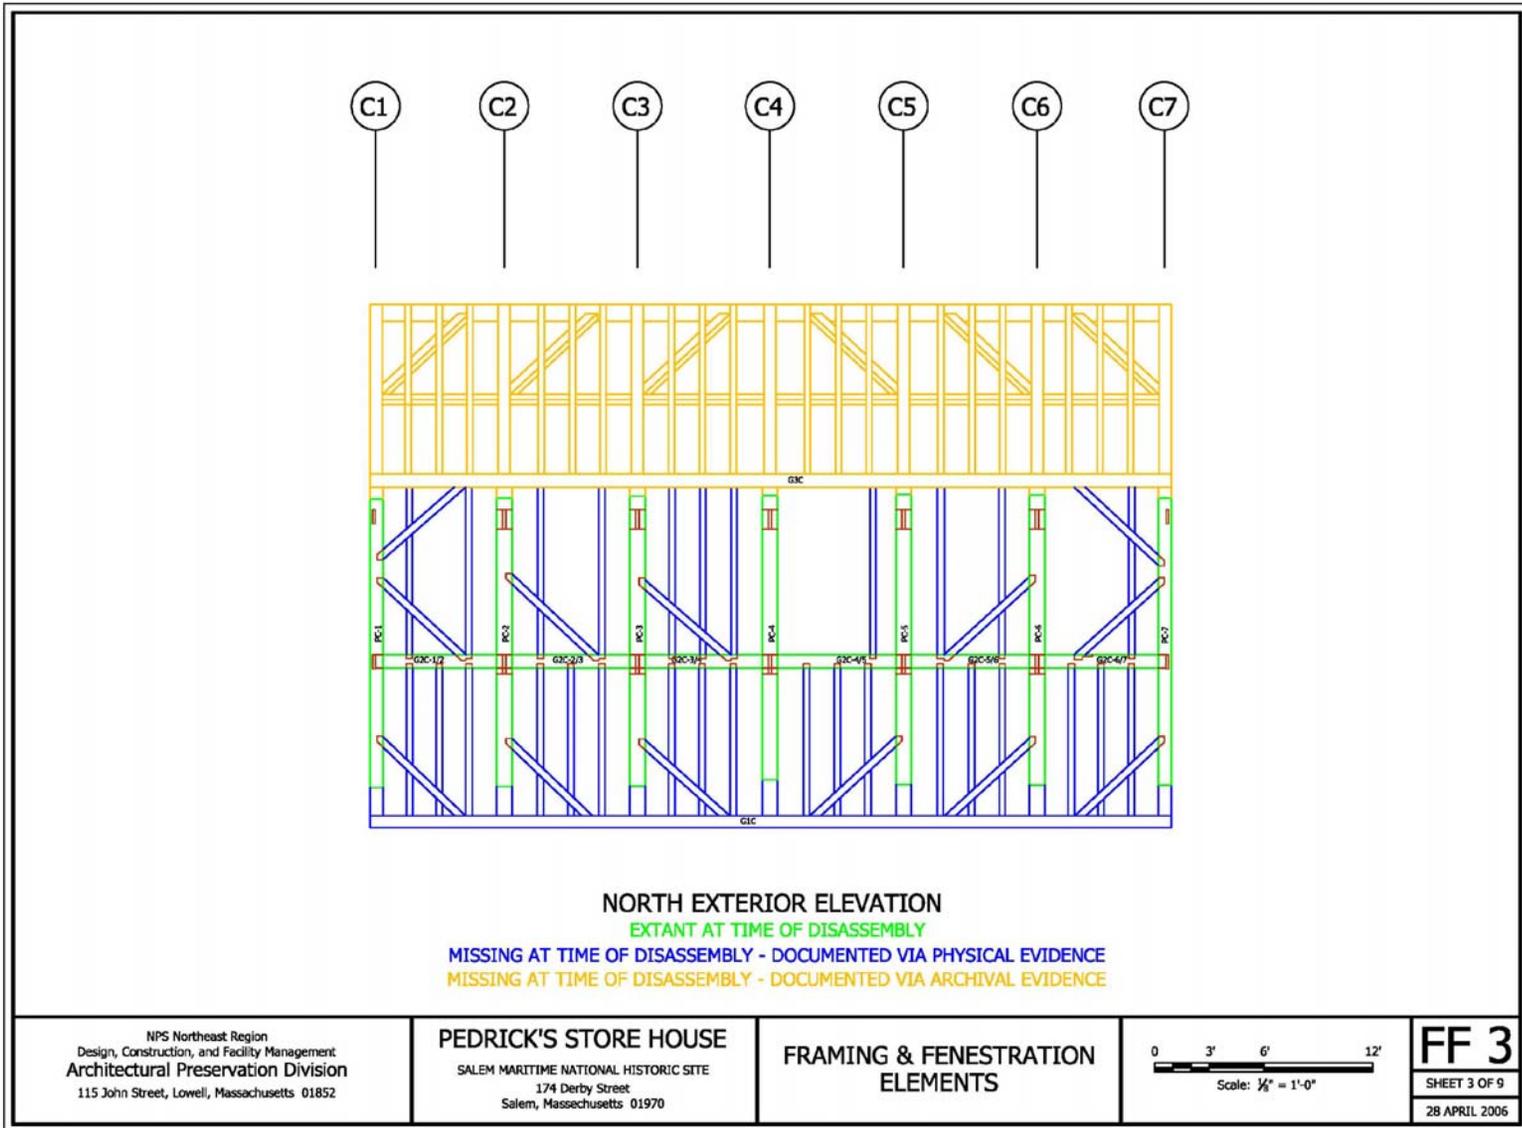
Measured drawing of framing and fenestration elements: North exterior elevation.
